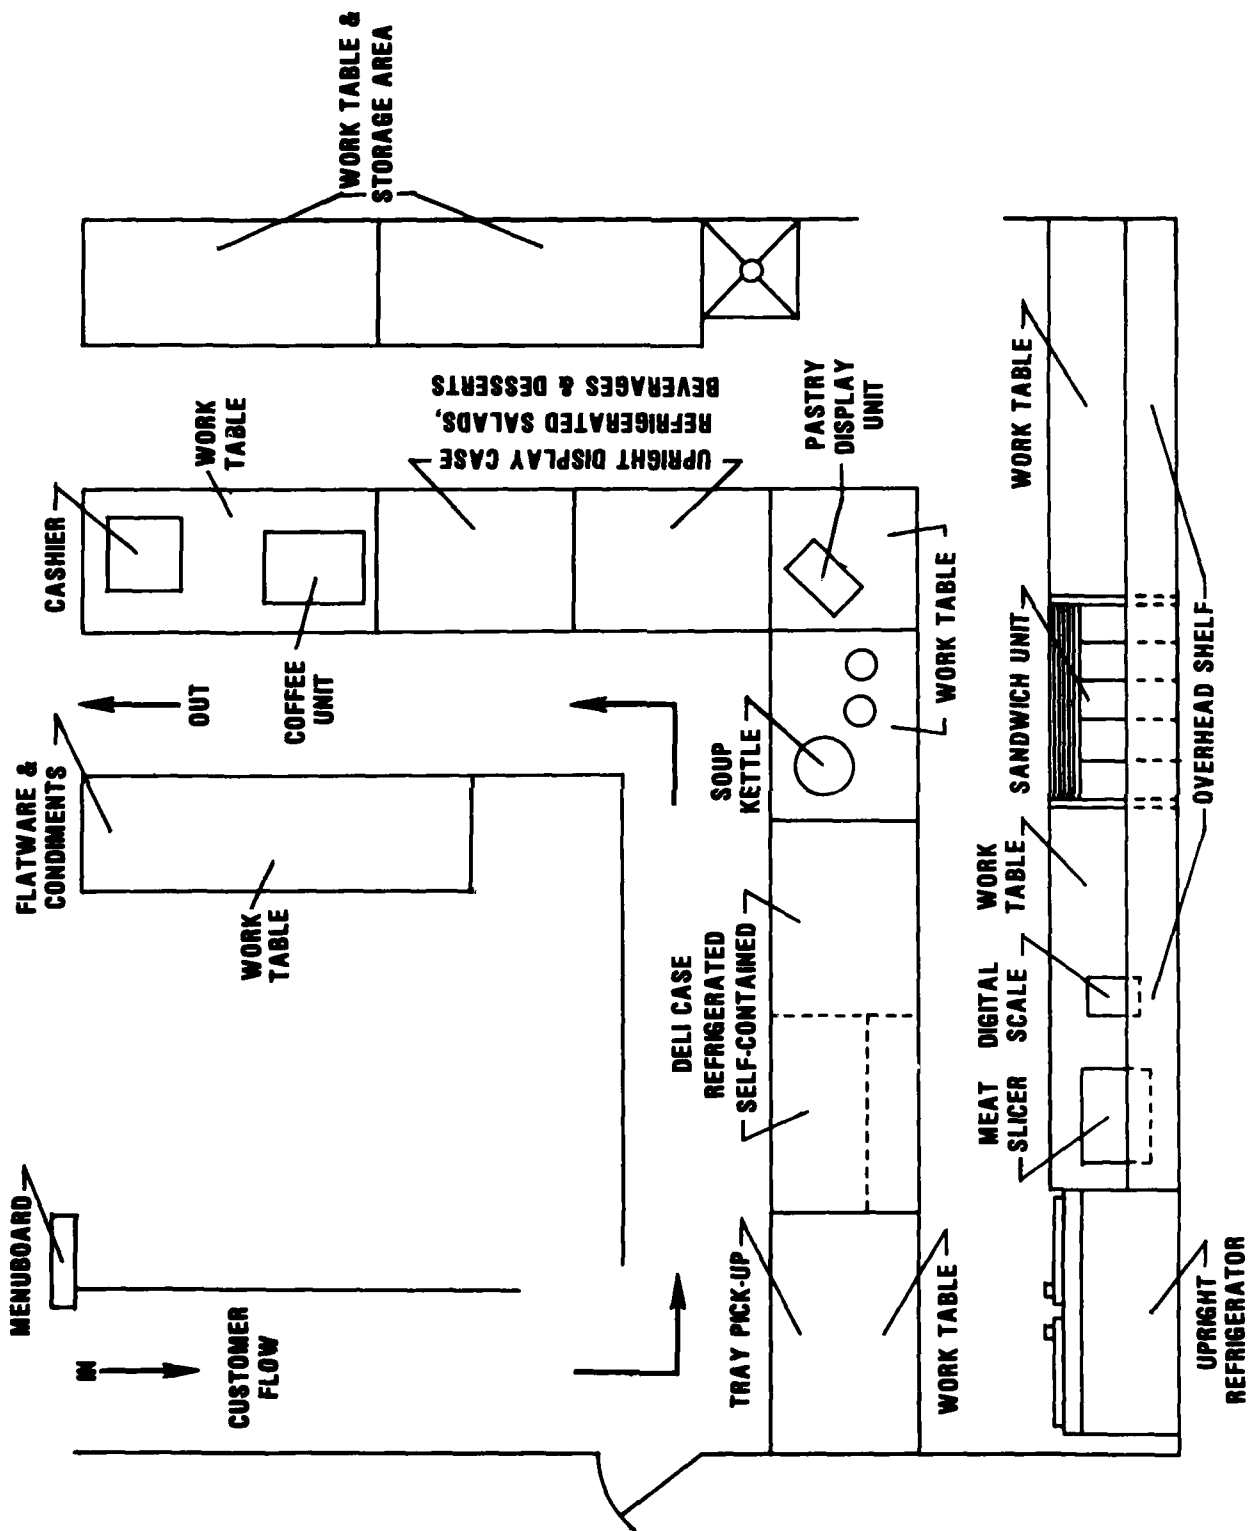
EQUIPMENT LAYOUT AND CUSTOMER FLOW
